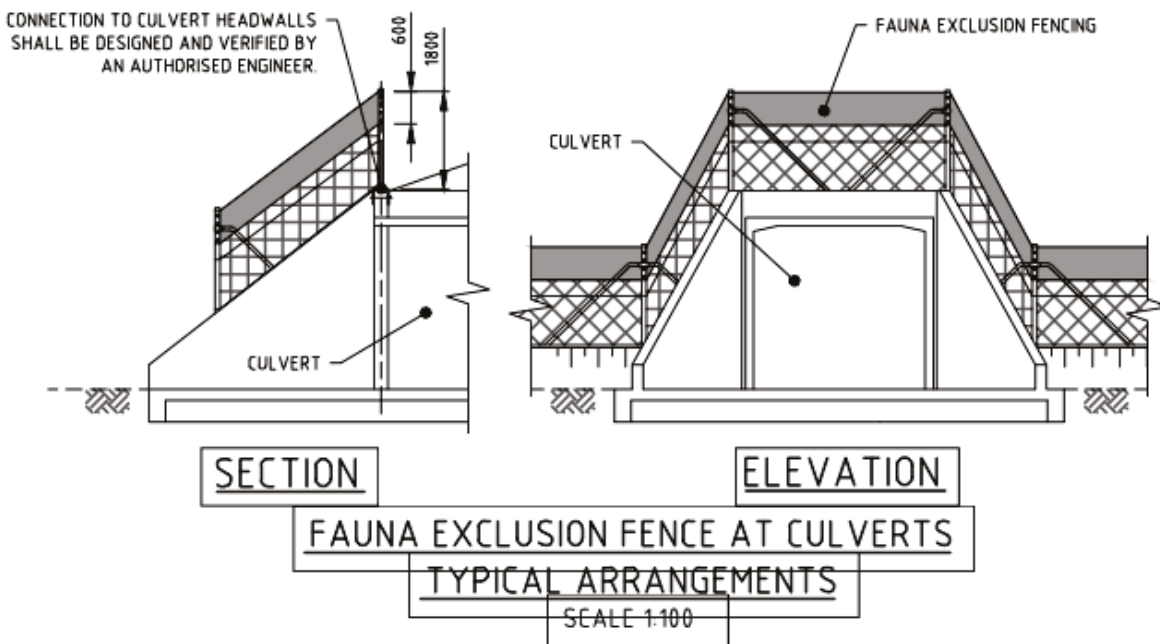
TYPICAL FENCE ARRANGEMENT OVER CULVERT OR FAUNA CROSSING
